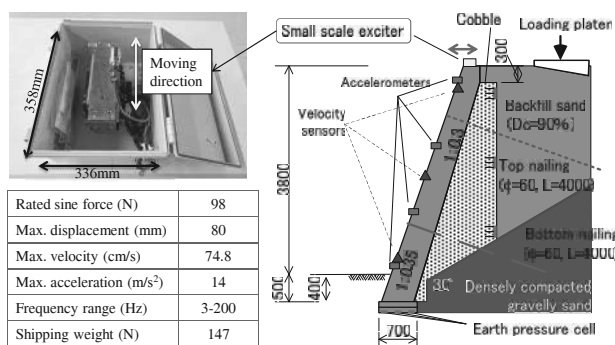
Cross section of model and outline of developed exciter (unit in mm)
